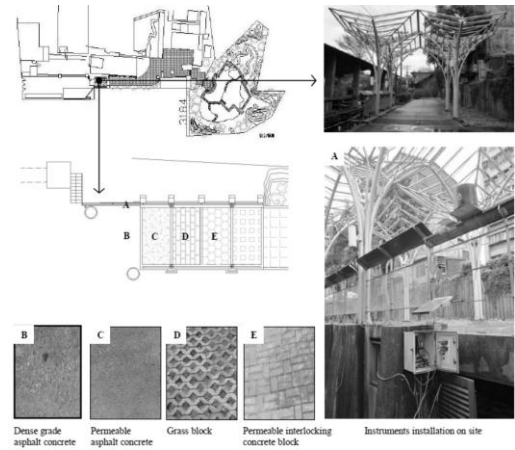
Photo and site plan of the permeable pavement experimental area in Xindian
